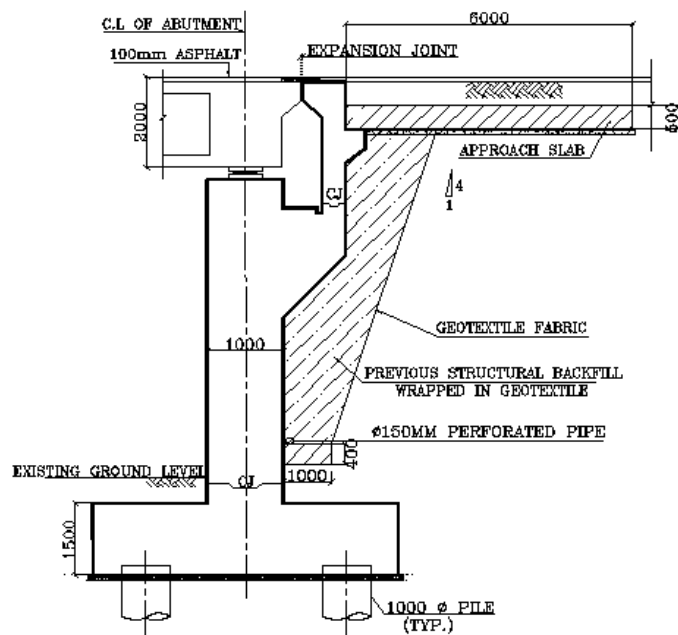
Typical concrete dimensions details for abutment at axes A1 and A2
